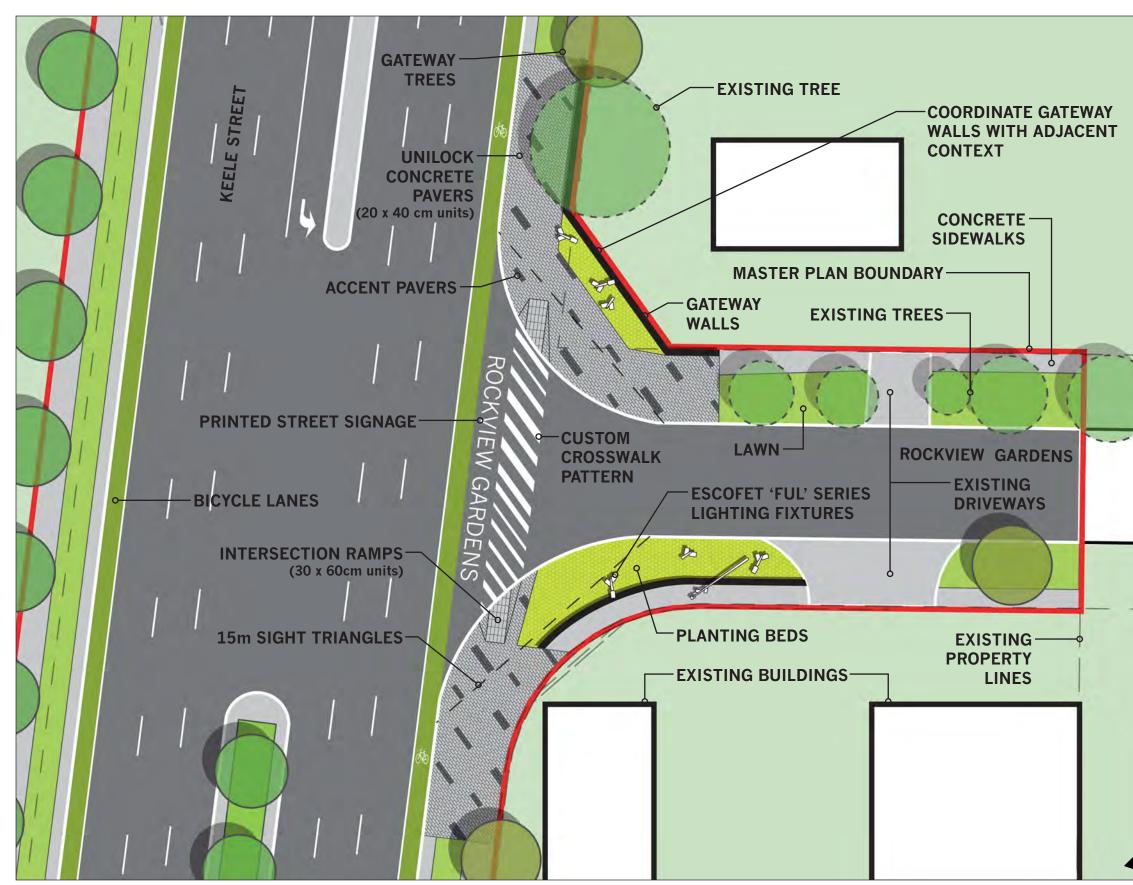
Rockview Gardens Gateway streetscape concept (secondary gateway).
